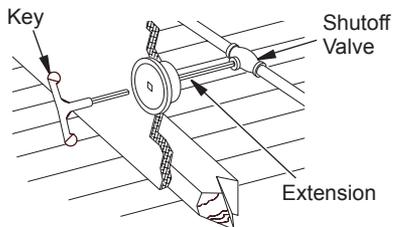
Typical Exterior Wall Gas Shutoff Installation
